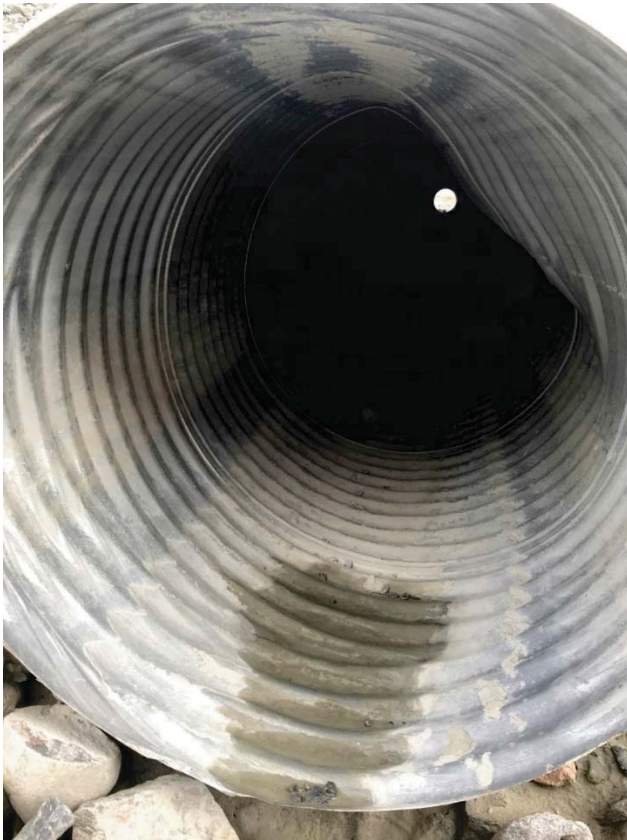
Culvert #3, Upstream Ends of Culverts, Looking North. Service Road on Right (12 September 2018)
